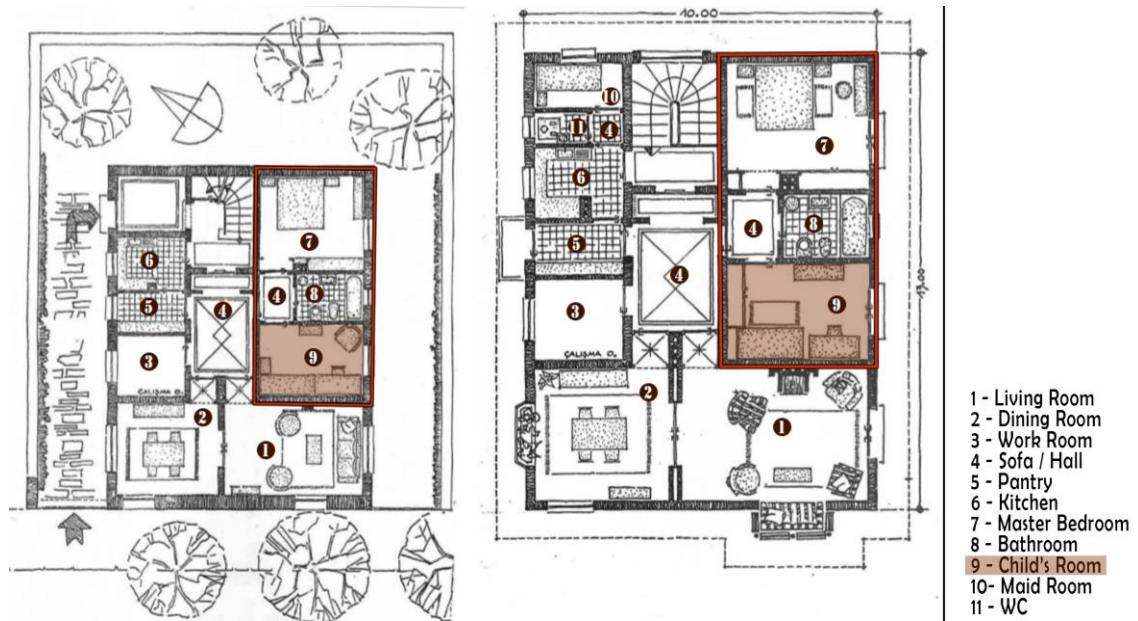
The ground and the first floor plans of Birgiler Apartment, İstanbul (Arkitekt, 1950, 7-10)
